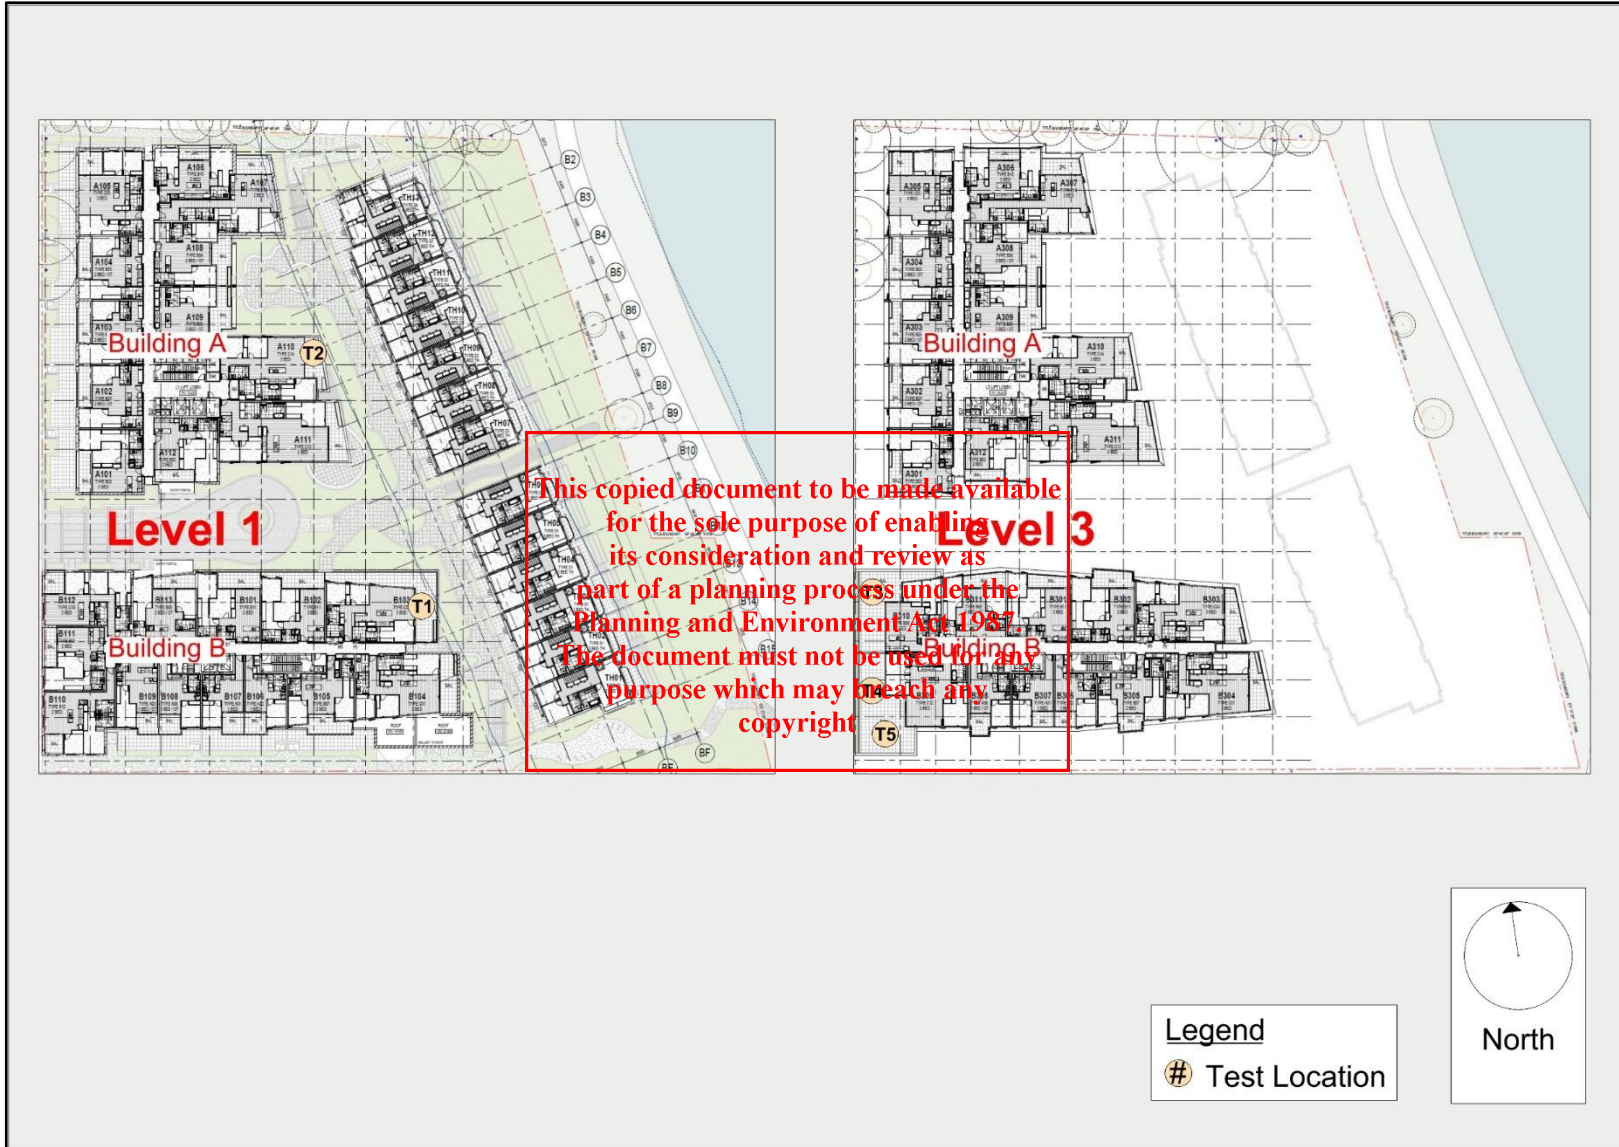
Level 1 and 3 Terraces Test Locations on the proposed 43 and 63-67 River Street development.
